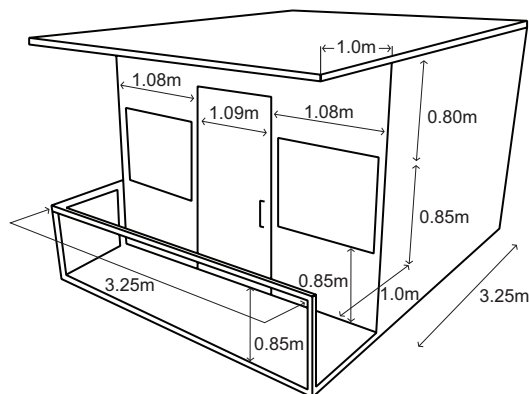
The real-scale computer-generated image of Case 7 model (See Figure 3) with 100 per cent porosity balustrade, 1.0 m width veranda and two sliding windows (1.08 m x 0.85 m each) with 50 per cent porosity
